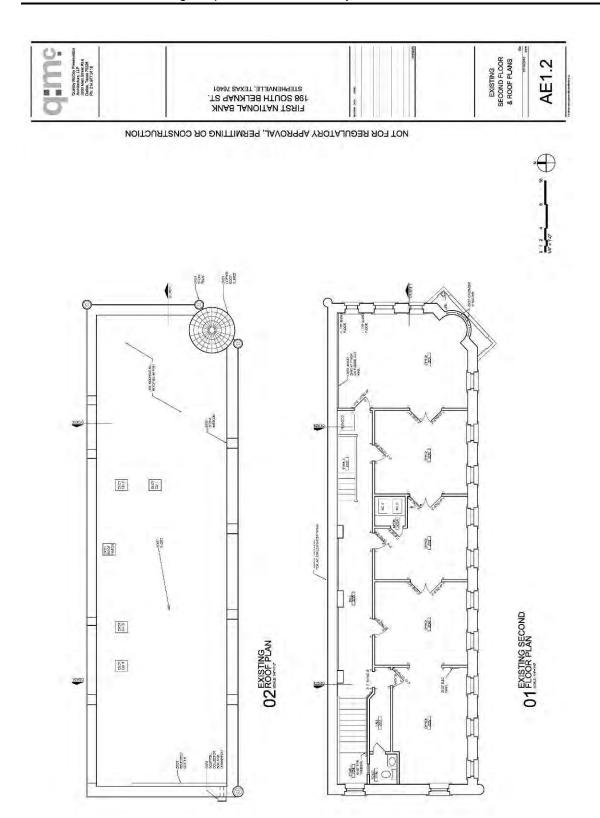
Existing Second Floor Plan and Roof Plan (prior to 2014-2015 rehabilitation)
